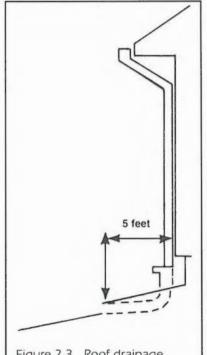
Roof drainage should be directed to the lawn at least 5 feet away from the foundation or paved surfaces.
